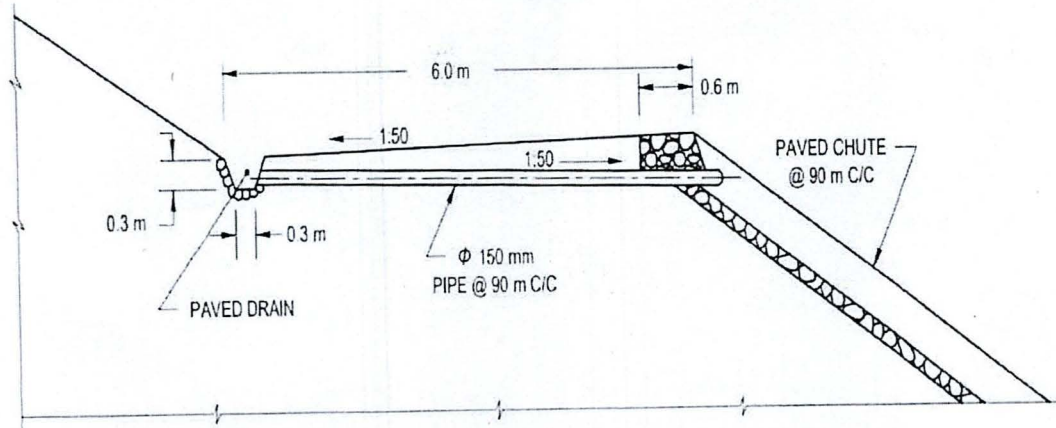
TYPICAL DOWNSTREAM SURFACE DRAINAGE ARRANGEMENT
